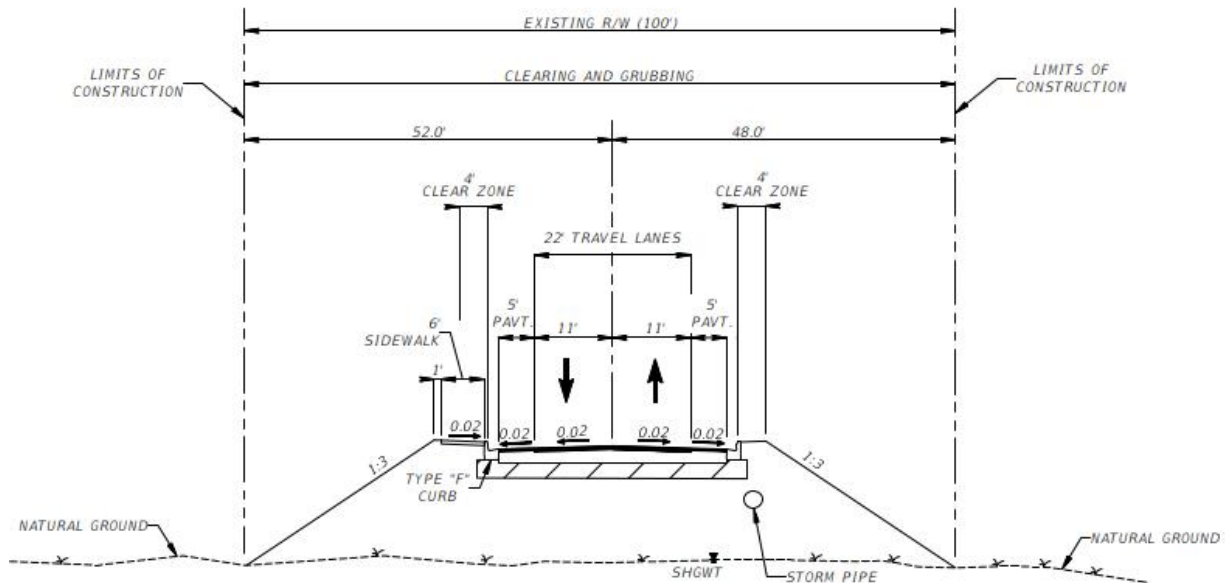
Build Alternative Typical Section, Clara Avenue Extension
